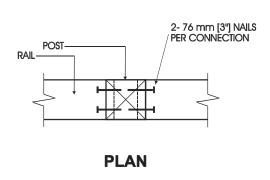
Exterior Connection: Top Rail Nailed to Post
